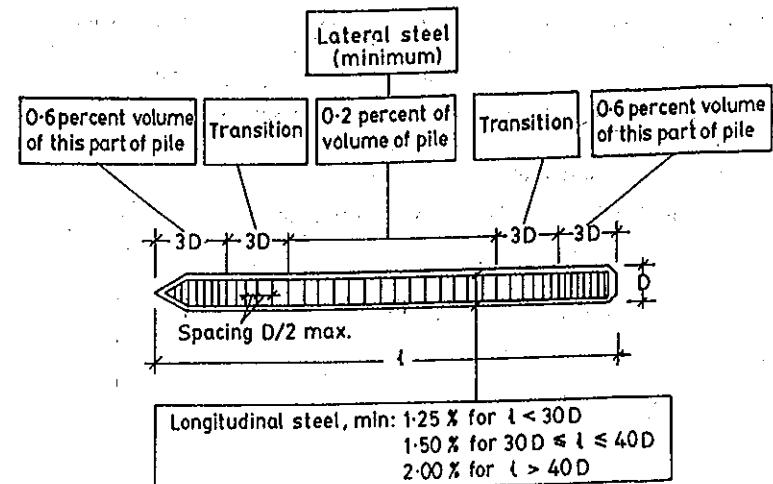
Minimum Steel Requirements in Precast Concrete Piles
